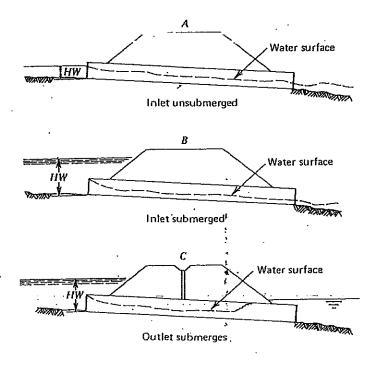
Inlet control for culverts. (Source: Hydraulic Design for Improved Inlets for Culverts, Federal Highway Administration, August 1972.)
